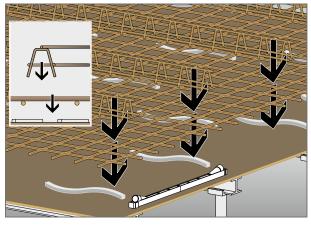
Dimensioning of the on-site bottom reinforcement according to the specifications from structural analysis.
